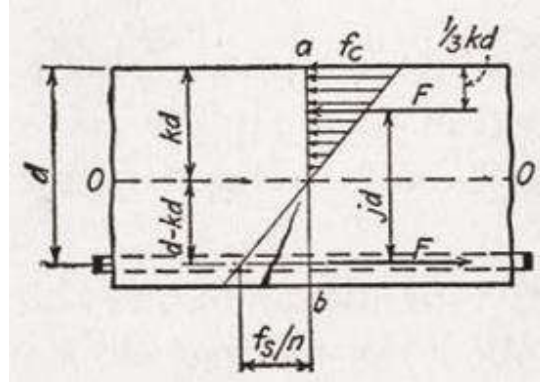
Stress Diagram for Reinforced Concrete Beam (Kirkham, 1932)
